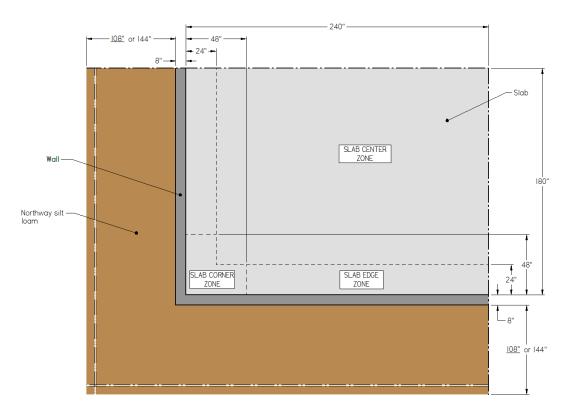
Retrofit foundation plan common to full basement and crawlspace sections (without insulation)
